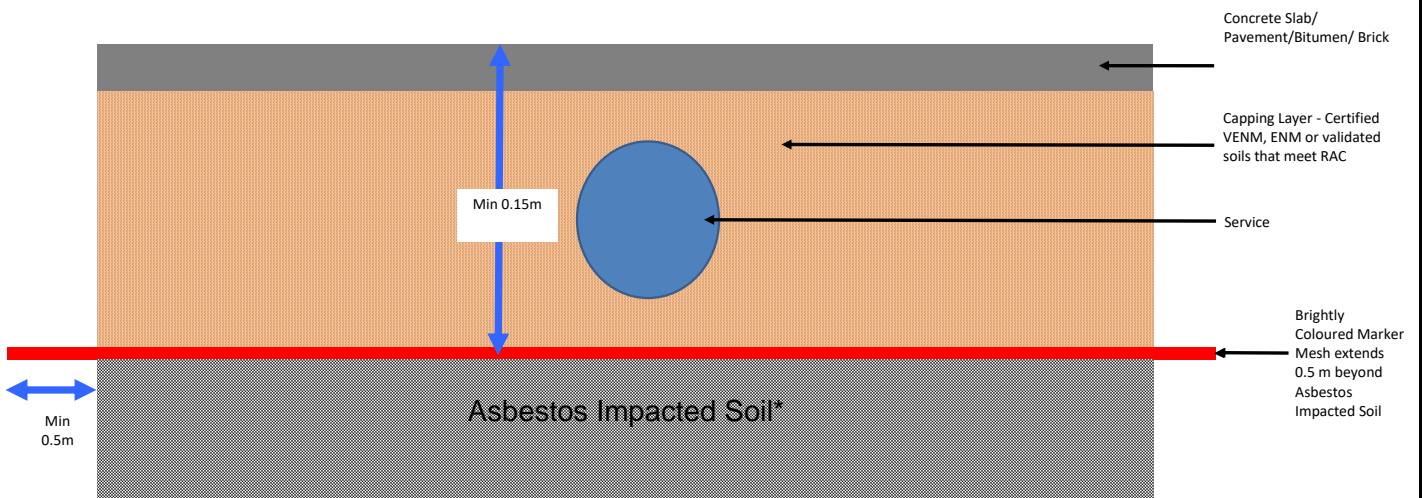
Service trench less than 0.15 m within capping layer beneath concrete hardstand/pavement areas
